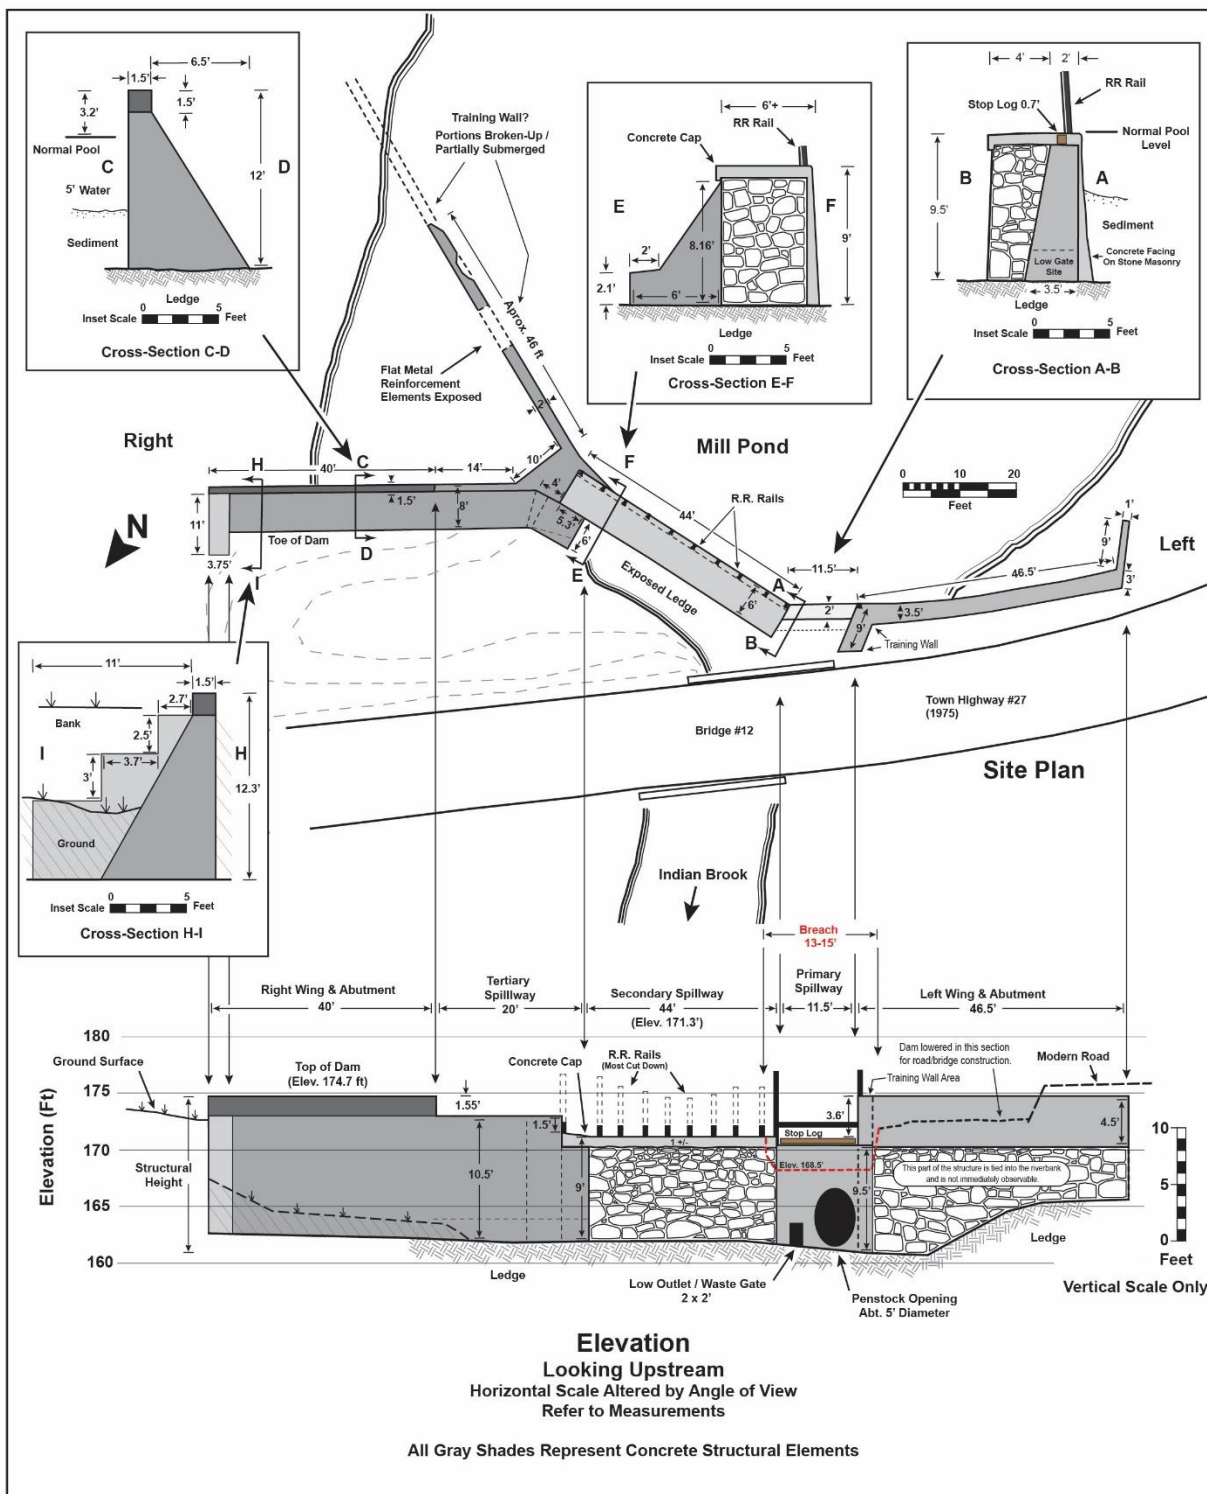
Plan, downstream elevation, and key cross-sections of Mill Pond Dam.
